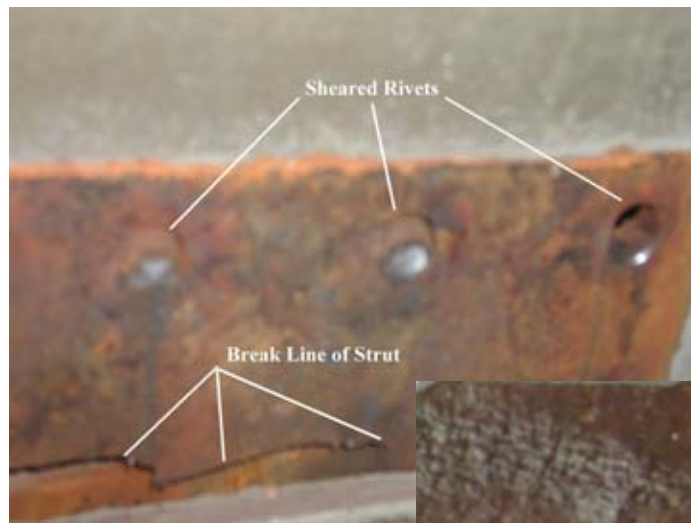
Shear Damage of Rivets and Fracture Surface
